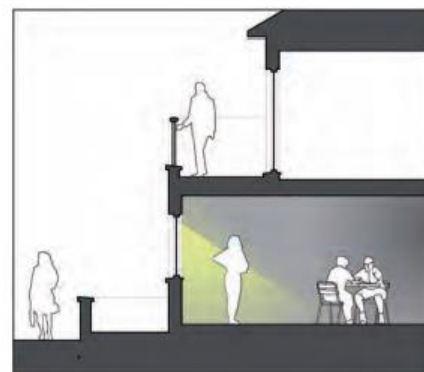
Section showing stepped back rooftop access ways. This gives improved daylight compared to a conventional section (see Figure 10).
